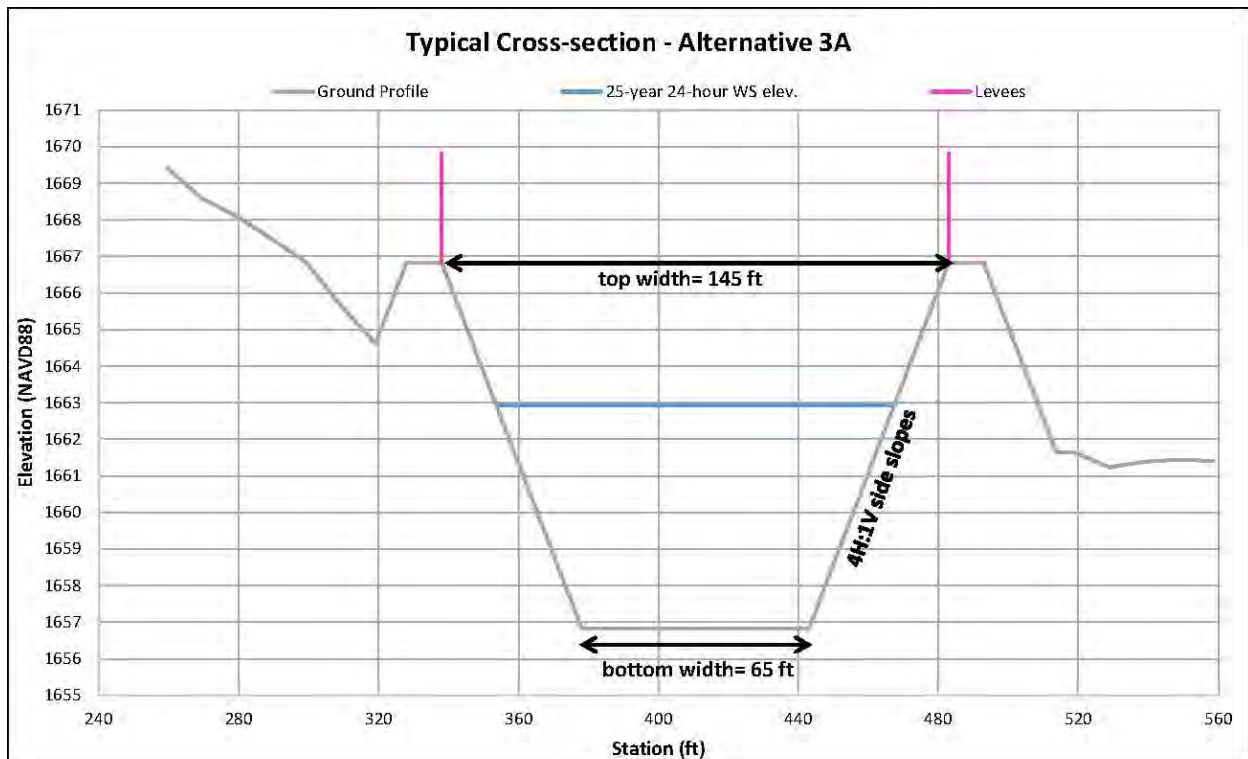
Typical Cross-sections Used for Alternatives 3A and 3B
